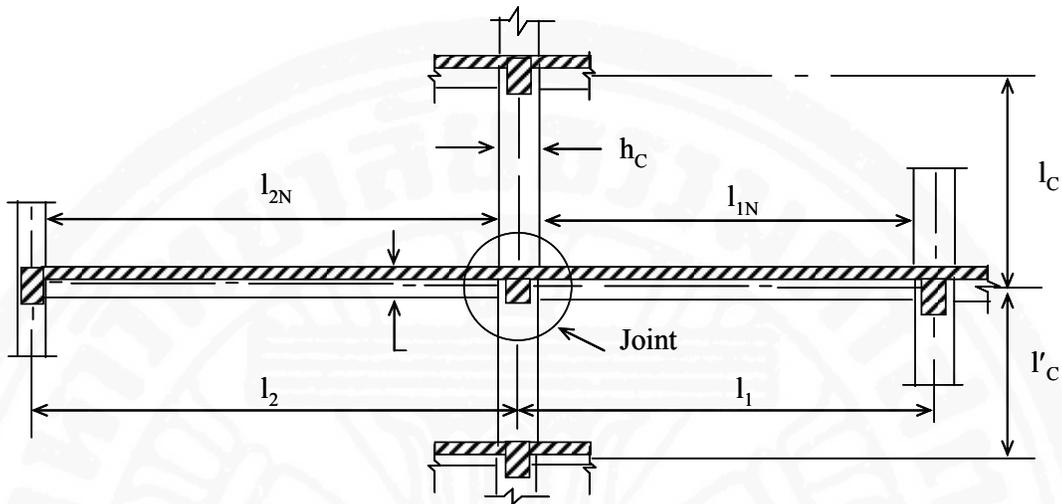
Interior Beam-Column Subassemblages (Source: Paulay and Priestley, 1992)
